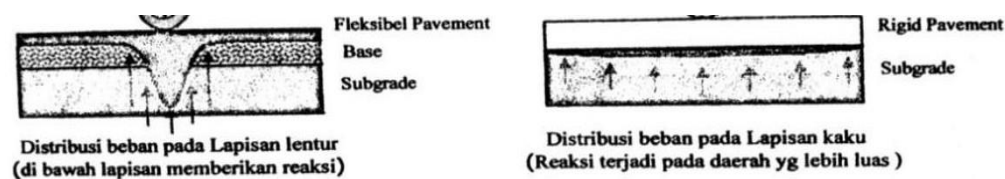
Distribution of Forces on Flexible Pavement and Rigid Pavement
